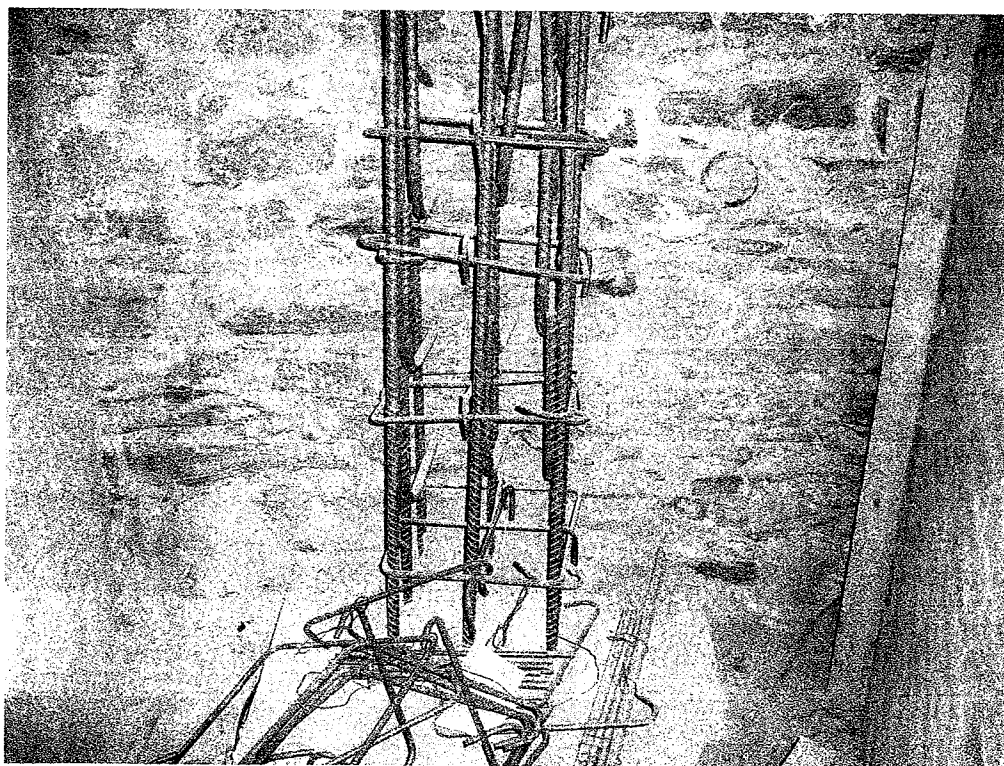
Steel reinforcement already in place for concrete pier at grid A/2.5
